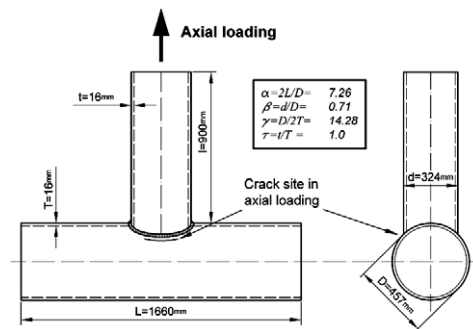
Nominal specimen dimensions and loading mode for six T-joints.
